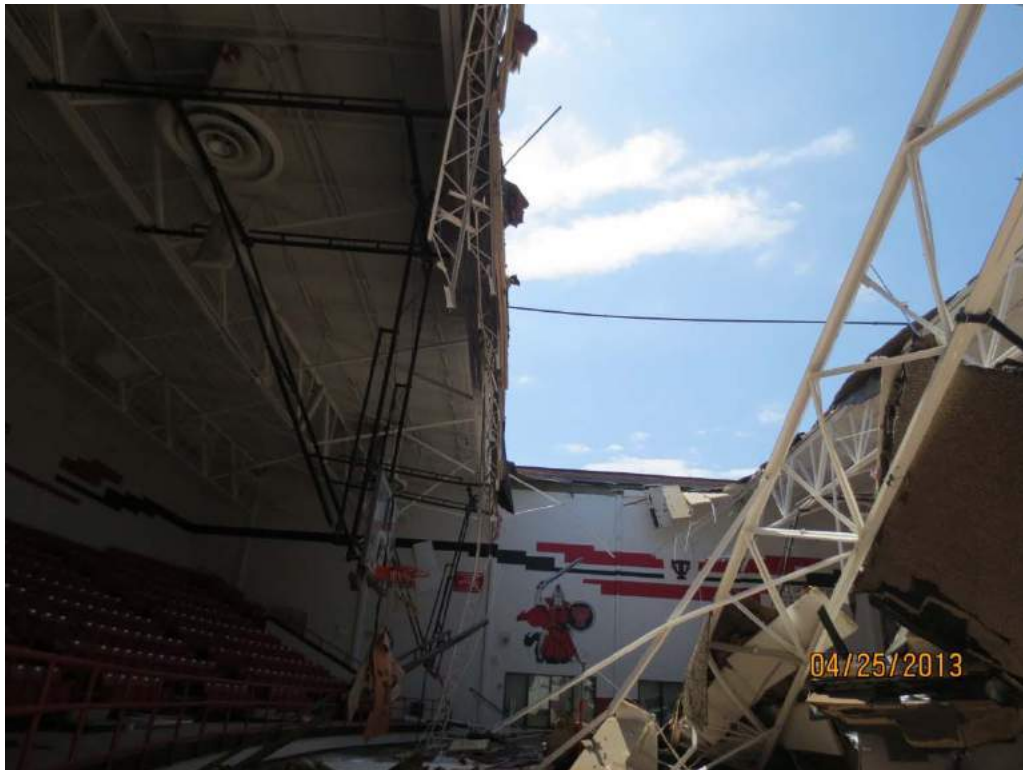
West high School Gymnasium1 Roof Collapse Viewed from Gymnasium Floor Entry
